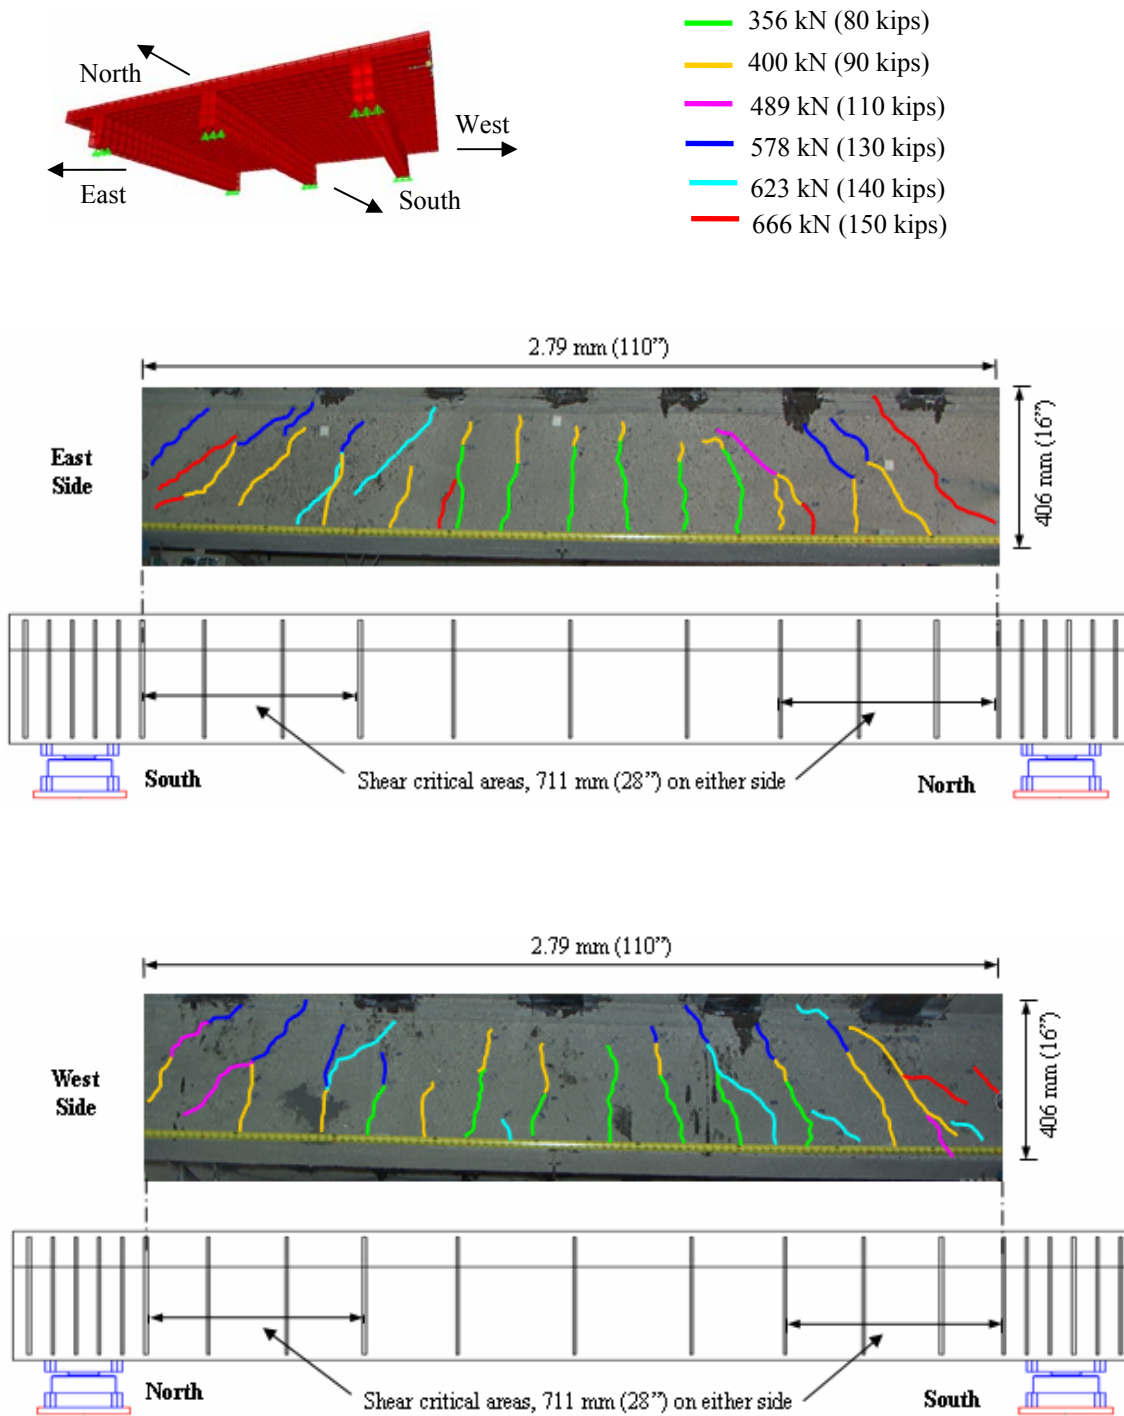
Crack pattern in the center girder at the end of phase 2 of test
